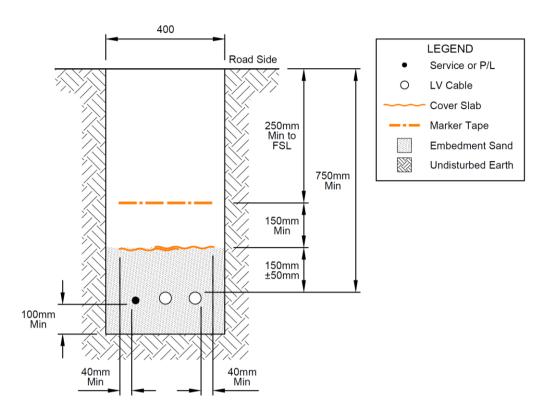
Typical Trench Section - 750mm Cable Burial Depth (2 LV, 1 Service or P/L shown)
